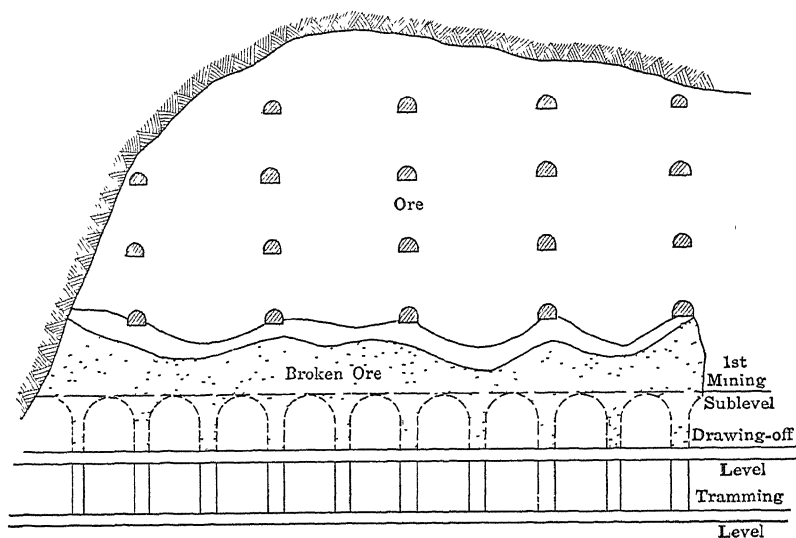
LONGITUDINAL SECTION OF STOPE DURING MINING PROCESS.
